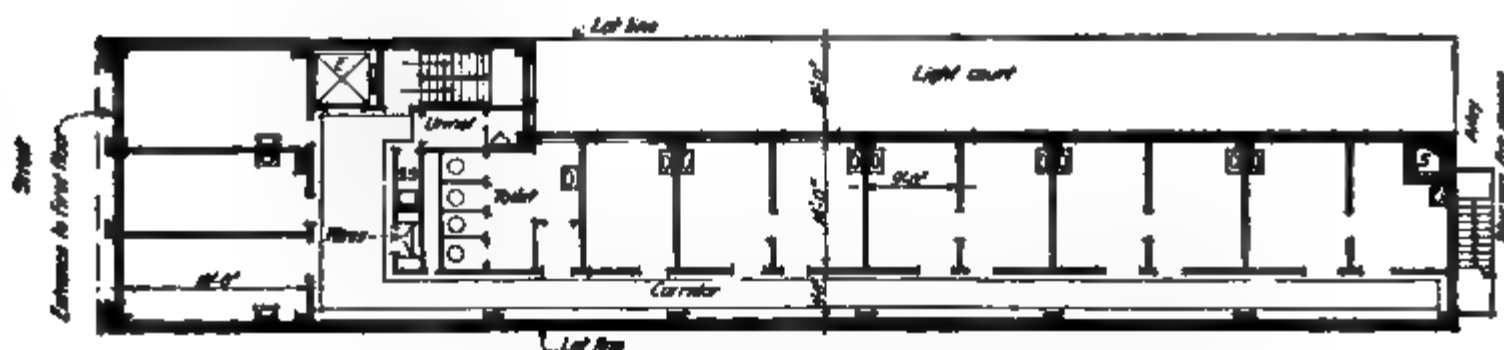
Typical plan of 4 or 5-story office building on inside lot.
